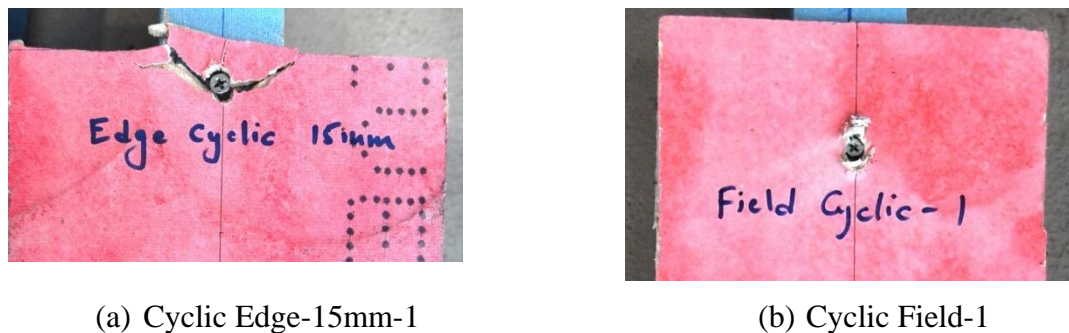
Failure mode of stud-fastener-sheathing connections under cyclic loading
